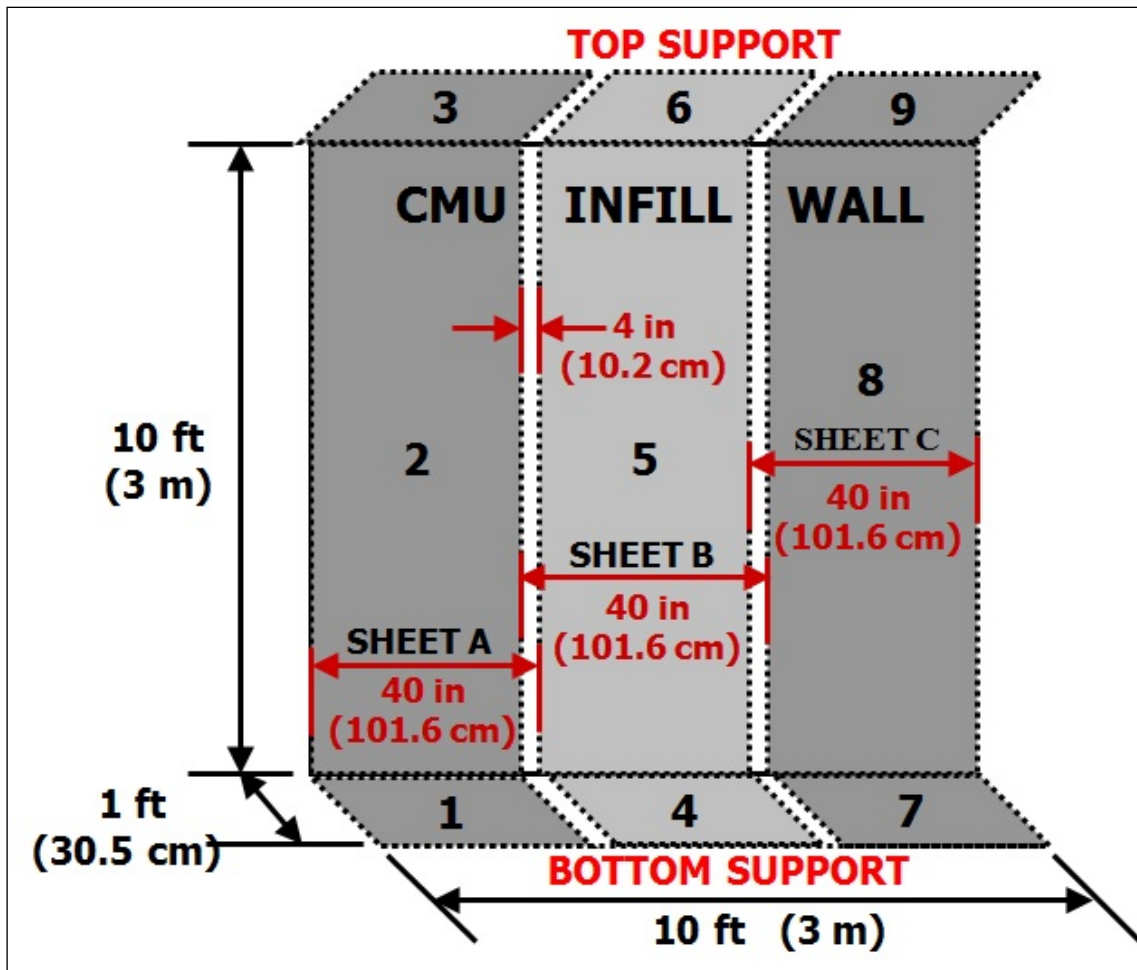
Wall schematic illustrating the order of trowel-on and film applications. Notice the 4-in. (10.2-cm) overlap of each film section (white strip). In this illustration, Sheet B overlaps Sheet A, and Sheet C overlaps Sheet B.
